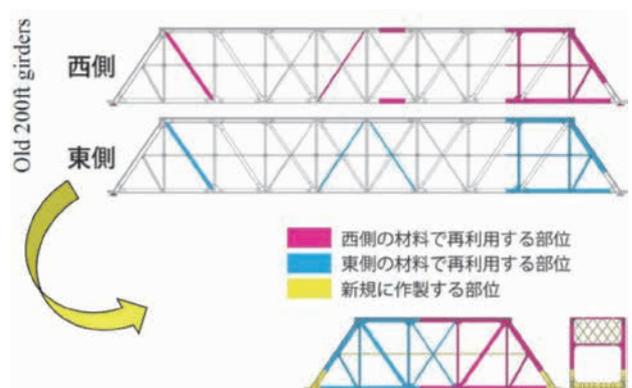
Old Egasaki Over Bridge with 200ft Plat Truss
